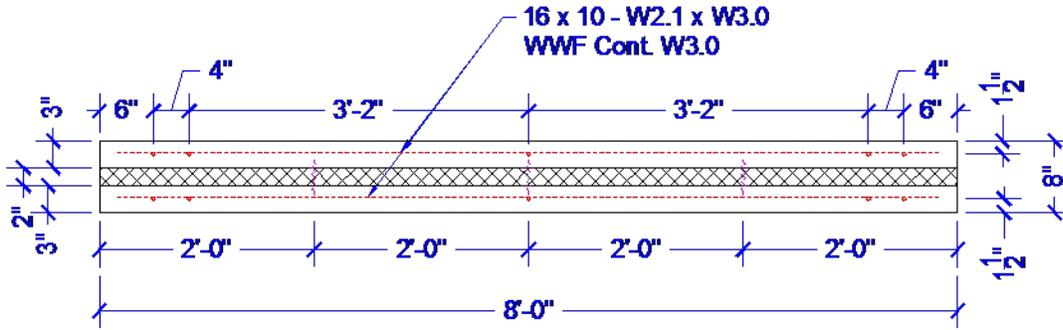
TCA Composite 3-2-3 Single-span Static Specimen TS2 Details
